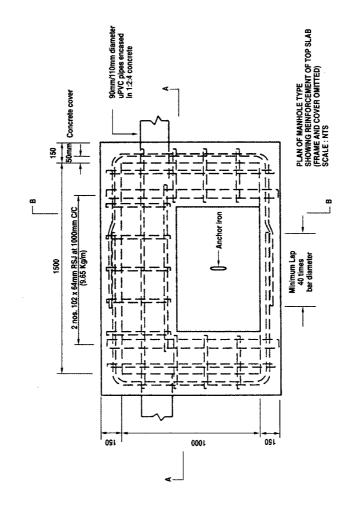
MANHOLE DRAWINGS - TYPE MX1
